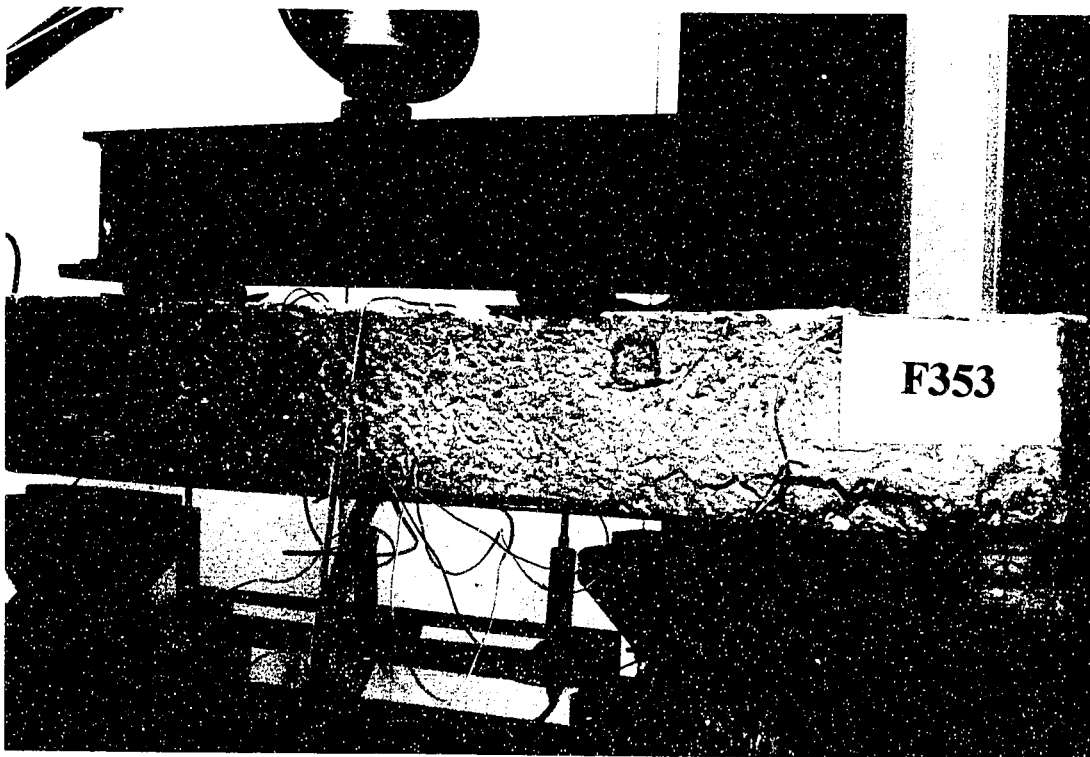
Photograph showing the mode of failure for beam F353 strengthened by 3 mm thick, 100 mm wide and 1100 mm long plate with 30 mm c/c spacing of stirrups
